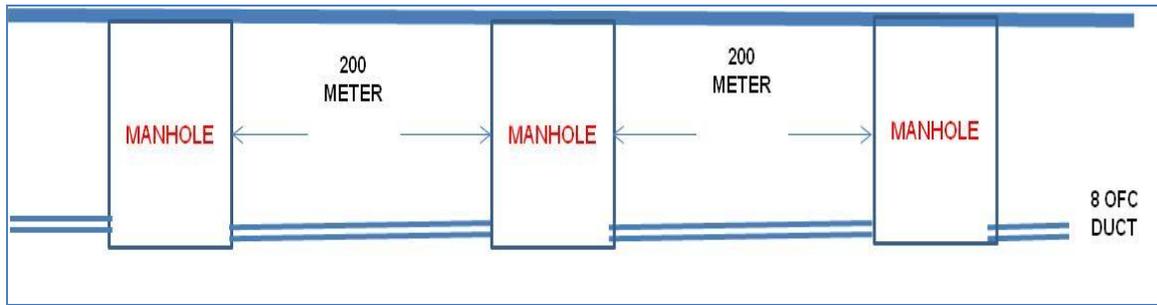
MANHOLES UNDERGROUND ELEVATION VIEW
